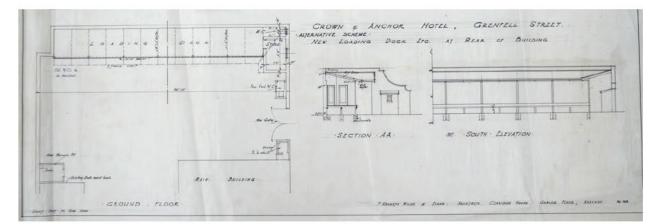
Details, New Loading Dock, Crown and Anchor Hotel, 1928. Source: University of South Australia, Architecture Museum
